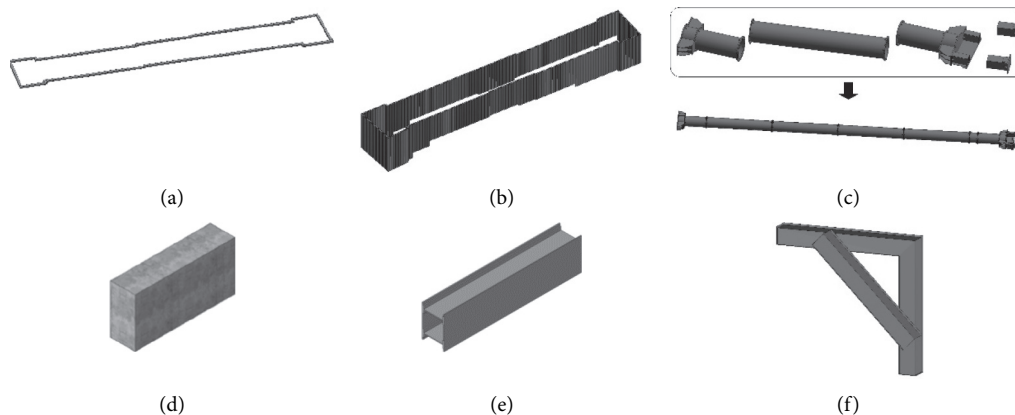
Models of main structure components. (a) Crown beam. (b) Fender pile. (c) Steel support. (d) Concrete support. (e) Steel purlin. (f) Steel bracket.
